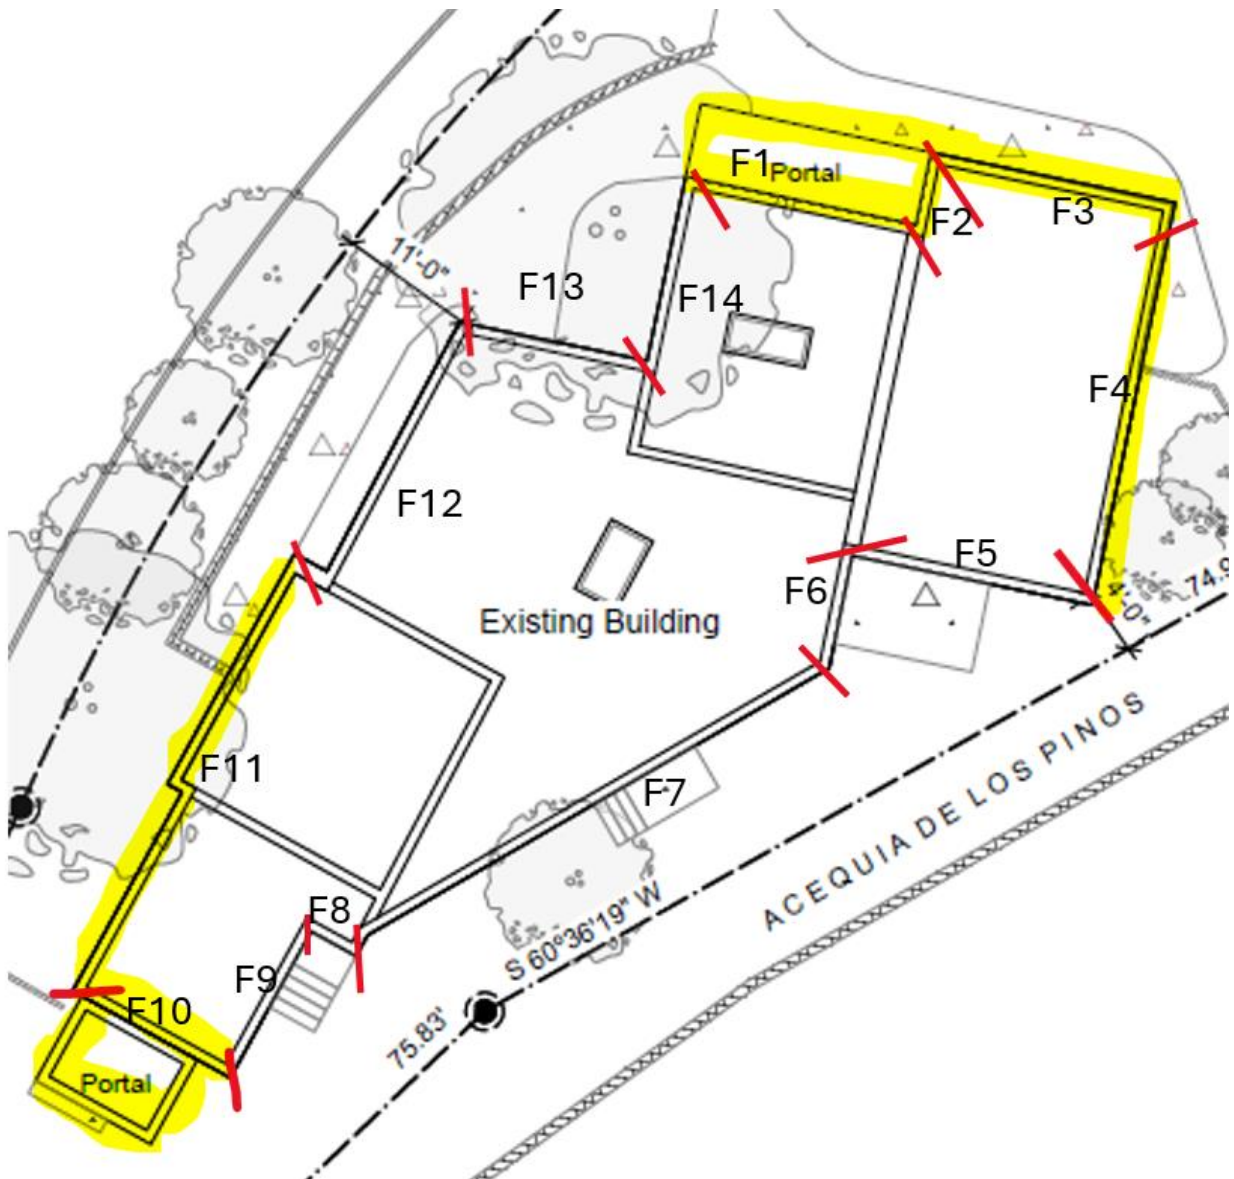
Façade Diagram (primary facade recommendations highlighted in yellow)
